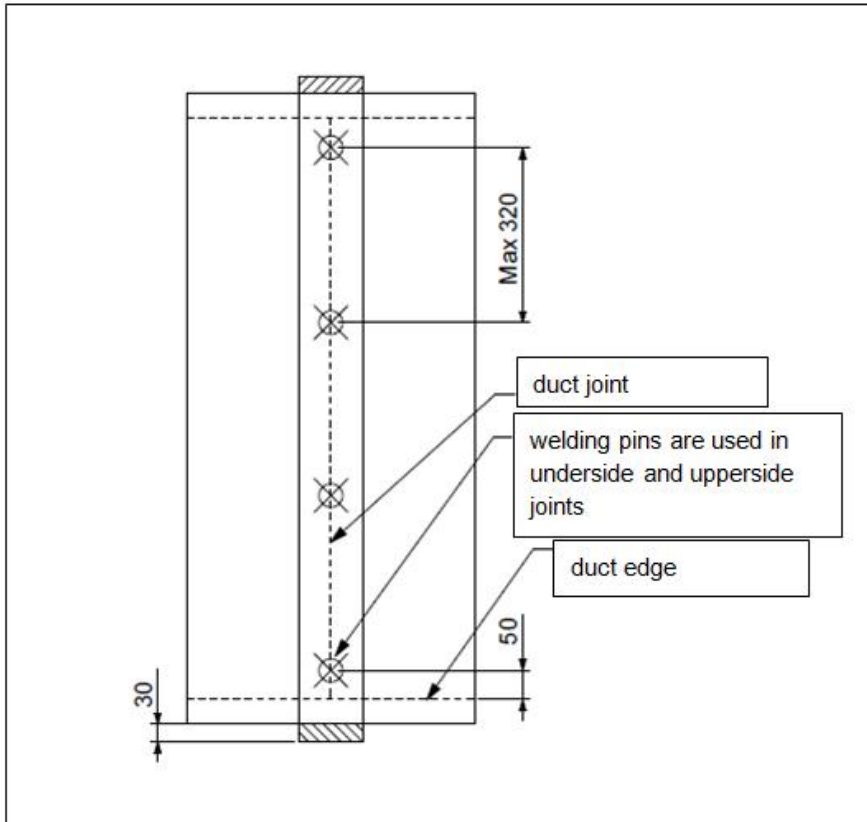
Ensuring duct joint with isolation slab from the side of the duct, technical drawing of principle
